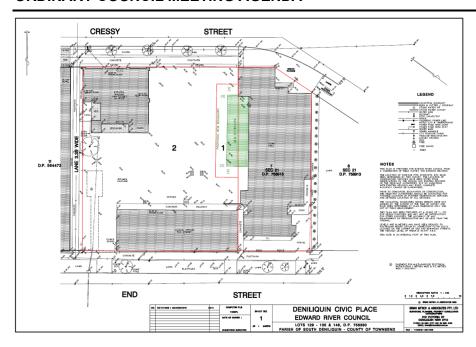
Proposed Plan of Subdivision (Source: Brian Mitsch)
